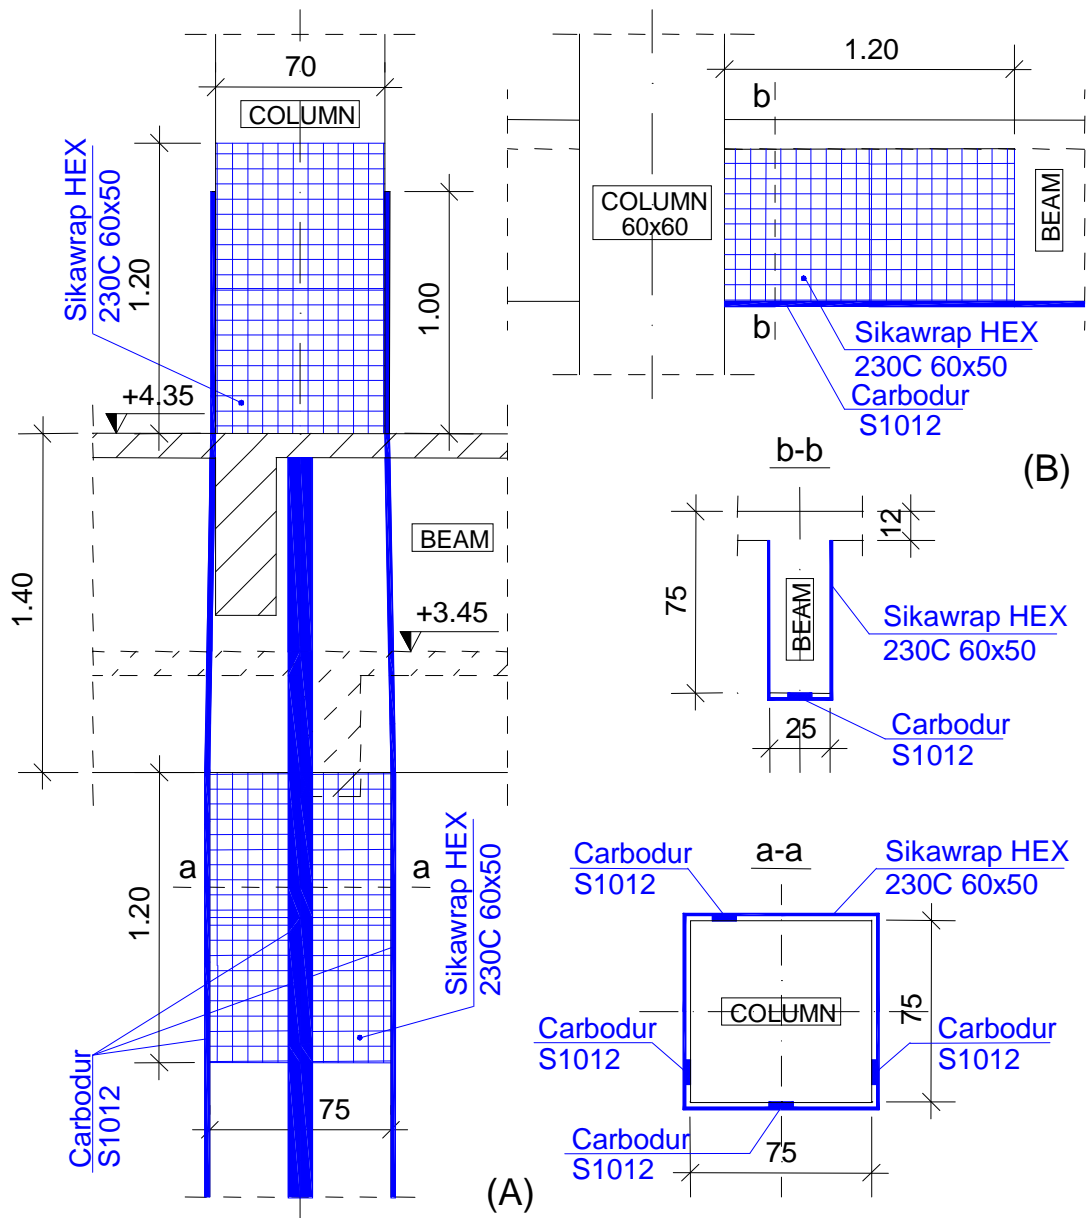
CFRP strengthening details for: (A) column; (B) main girder
